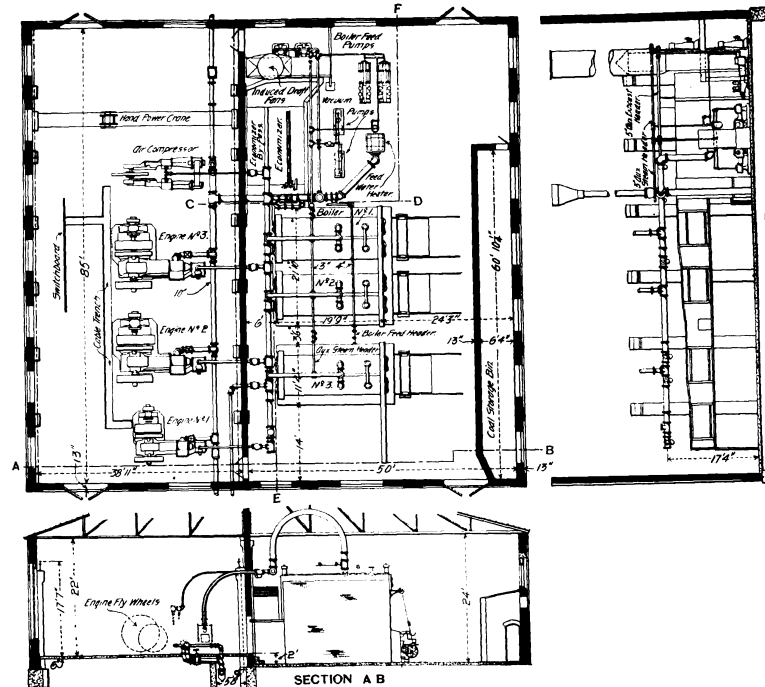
Plan and Section of Power Station—Michigan Central Shops, Jackson, Mich.
